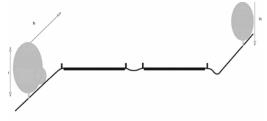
Cross section of the road with presented tree height given their distance from the roadway.
